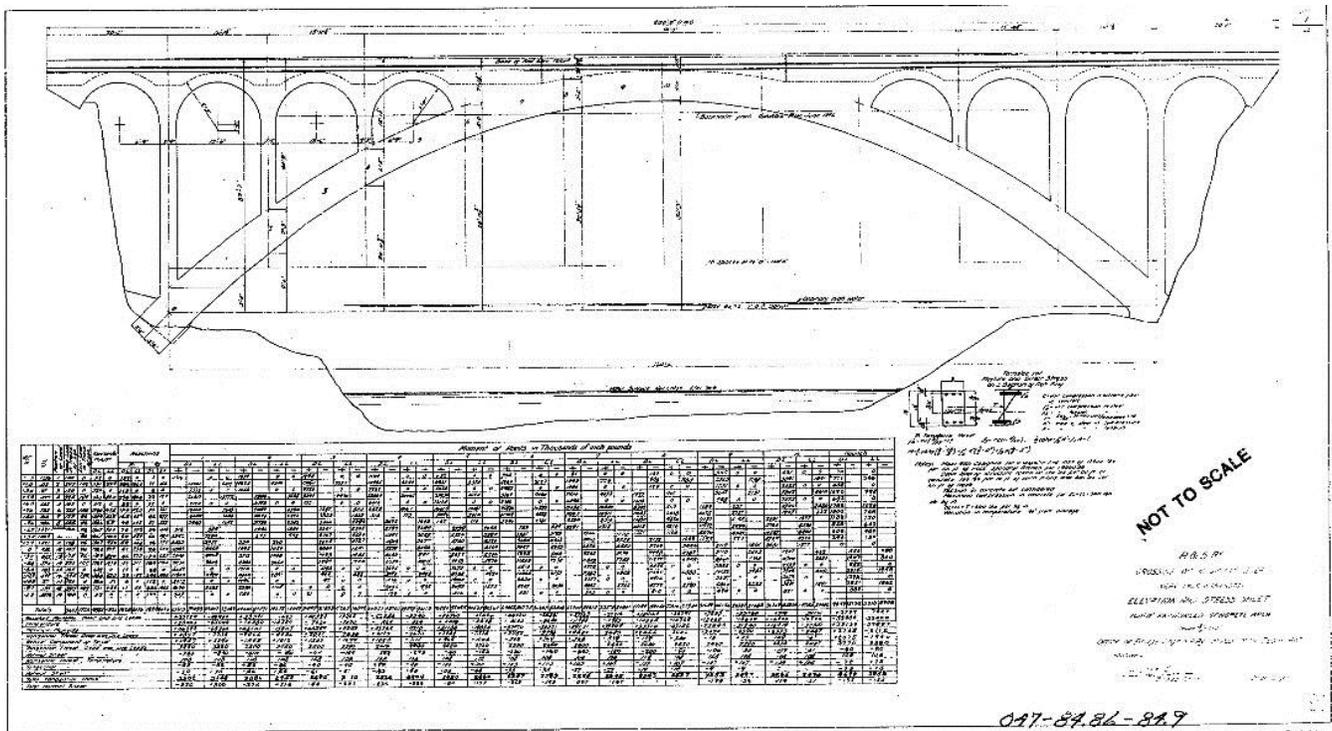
Klickitat River Bridge, reinforced-concrete arch.
